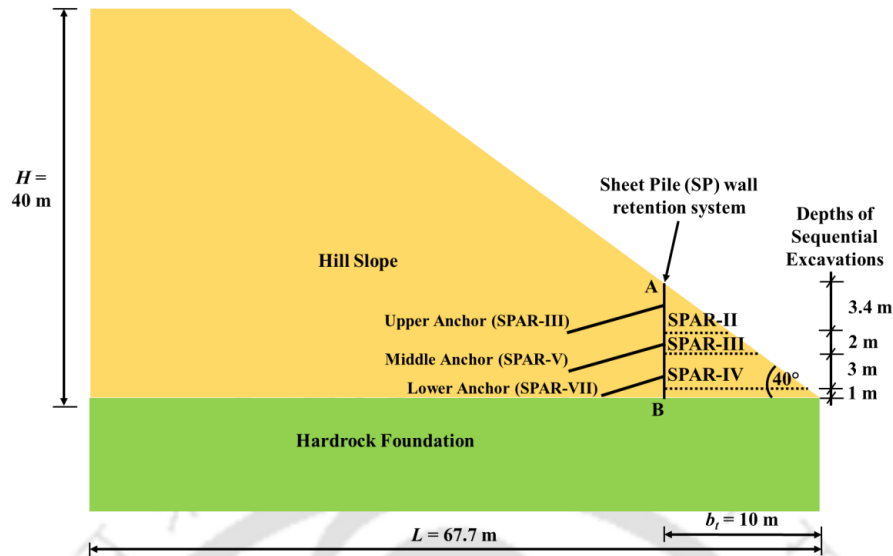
Schematic diagram of sheet-pile-anchor retention (SPAR) system used as protection measure against the sequential toe excavation of the hill slope
